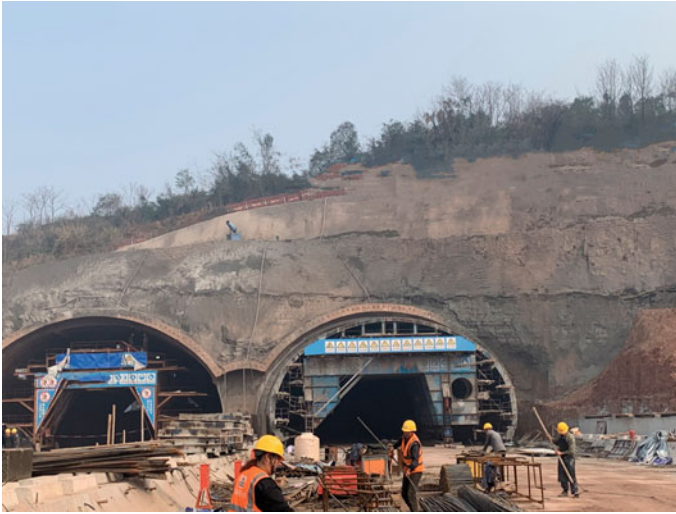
A practical view of the Xinsen avenue tunnel entrance construction
